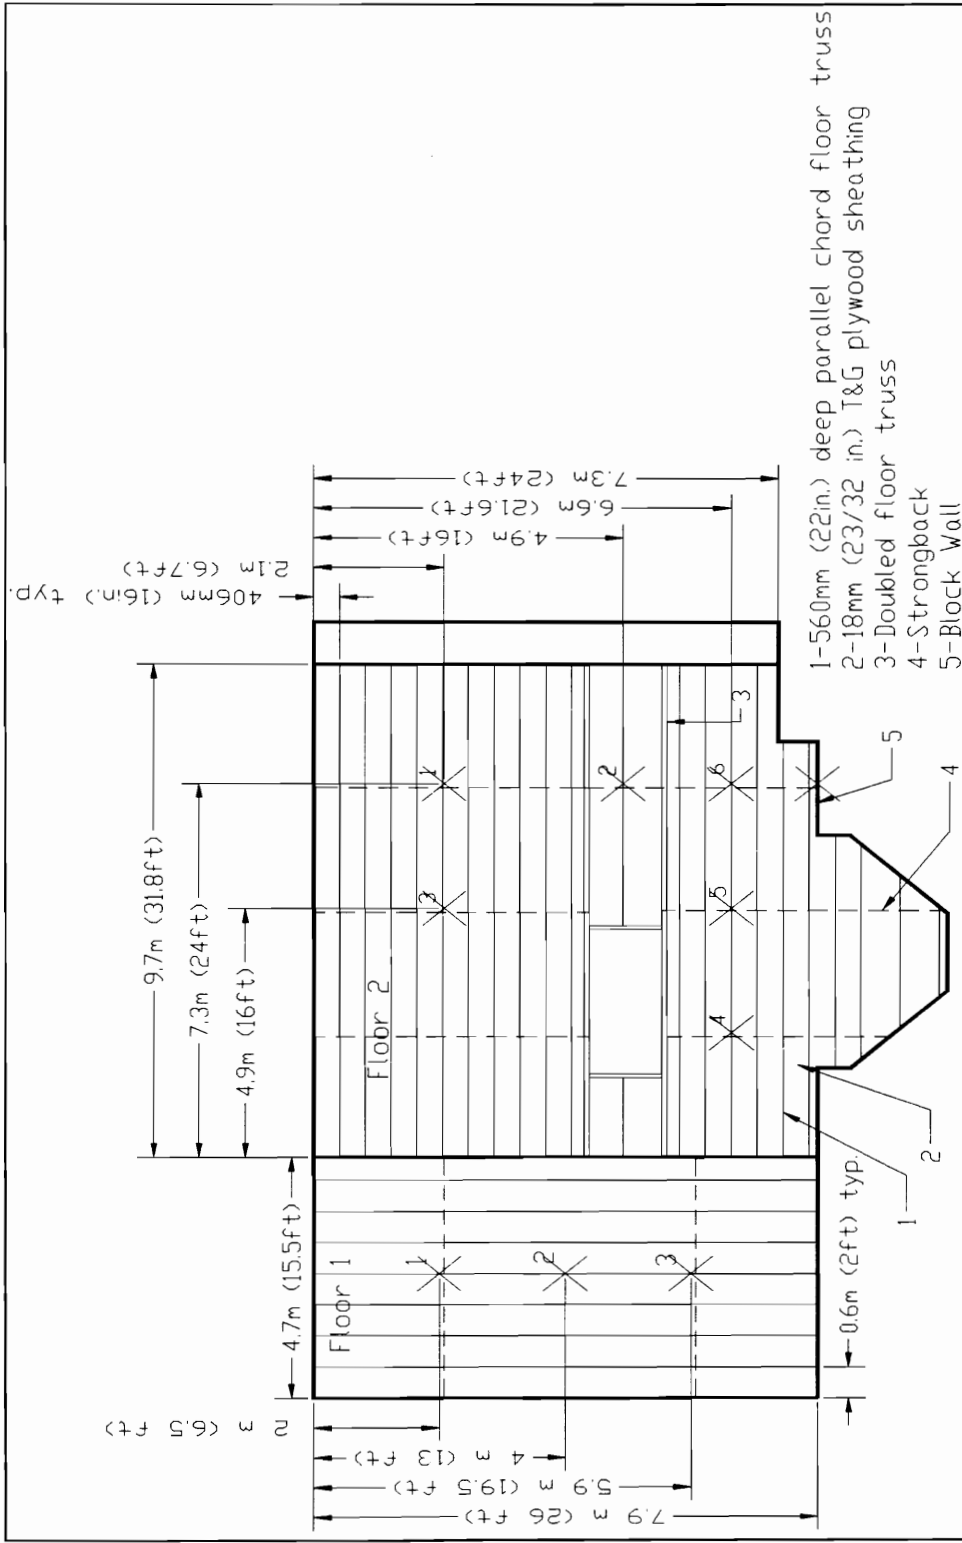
Structural Plan of Parallel Chord Truss House #1
